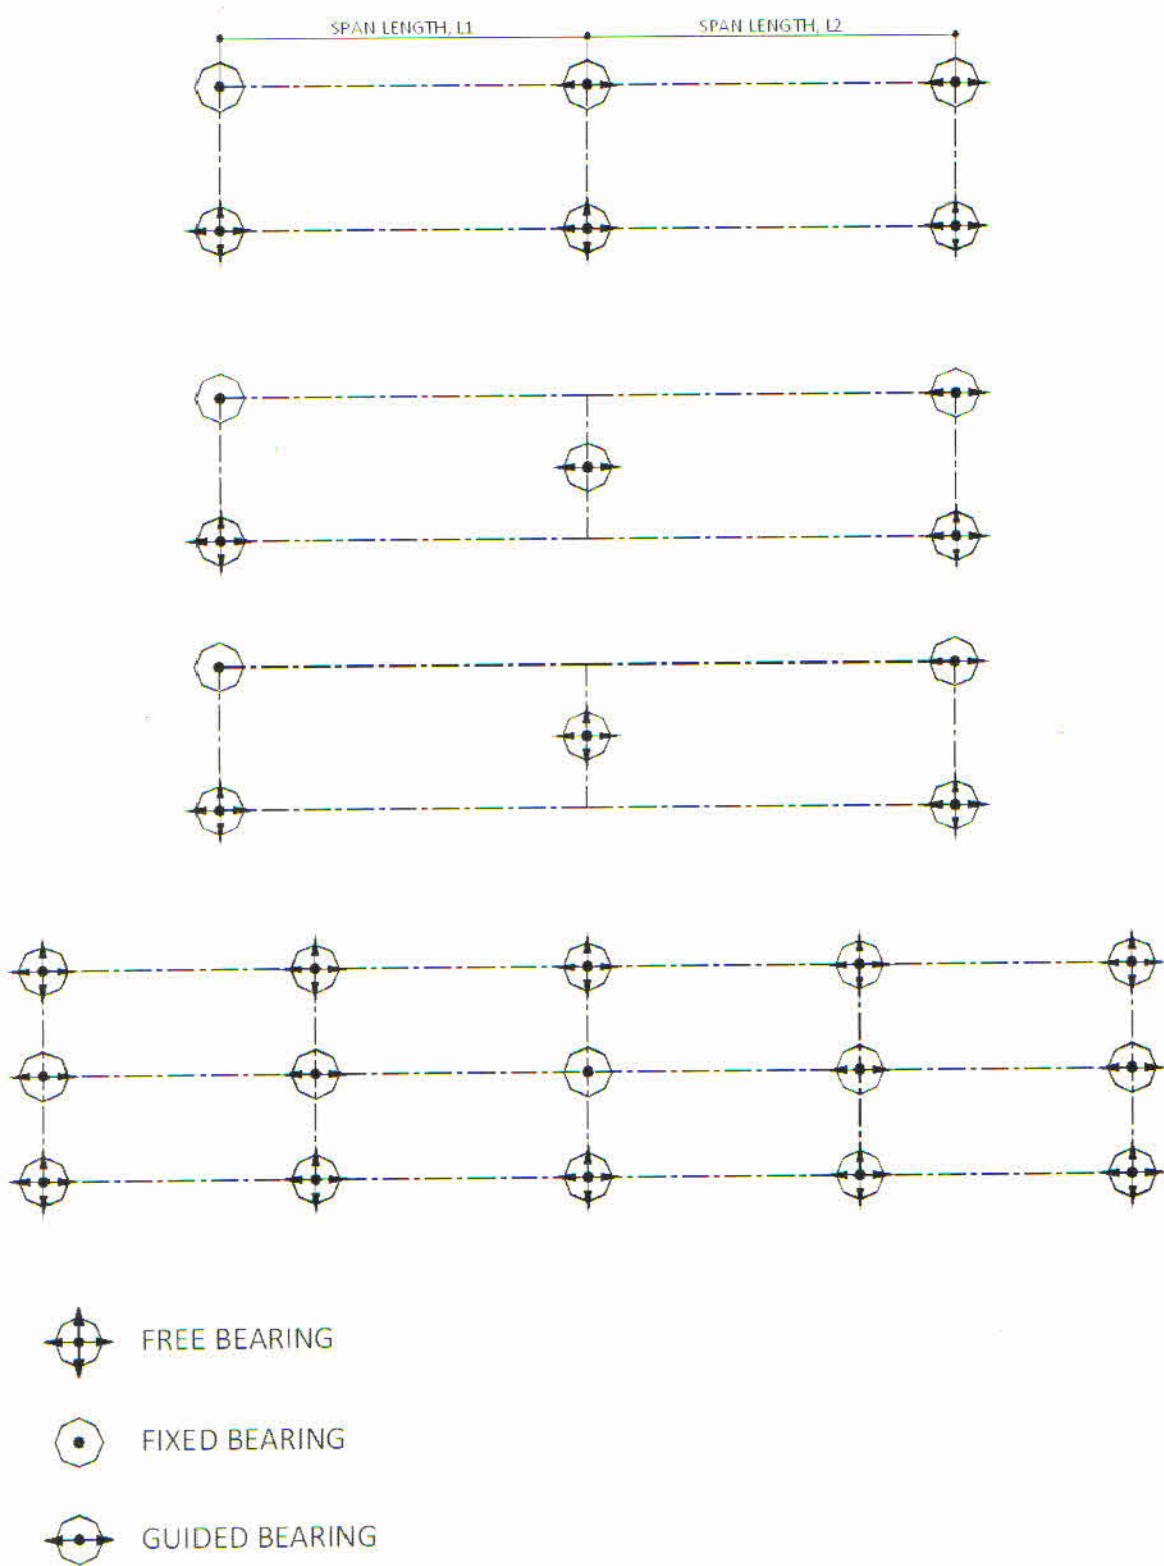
TYPICAL BEARING LAYOUTS FOR STRAIGHT CONTINUOUS BRIDGES
